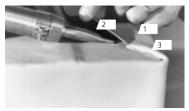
A OUTSIDE CORNER AT THE TOP OF PARAPETS
